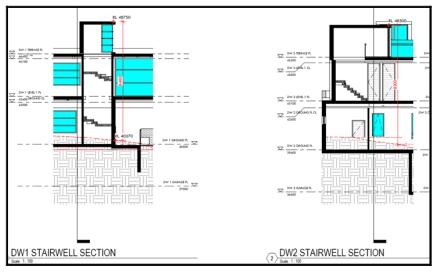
Section Plan showing three (3) storeys (*Source: Space 0.618:1, November 2018*)
